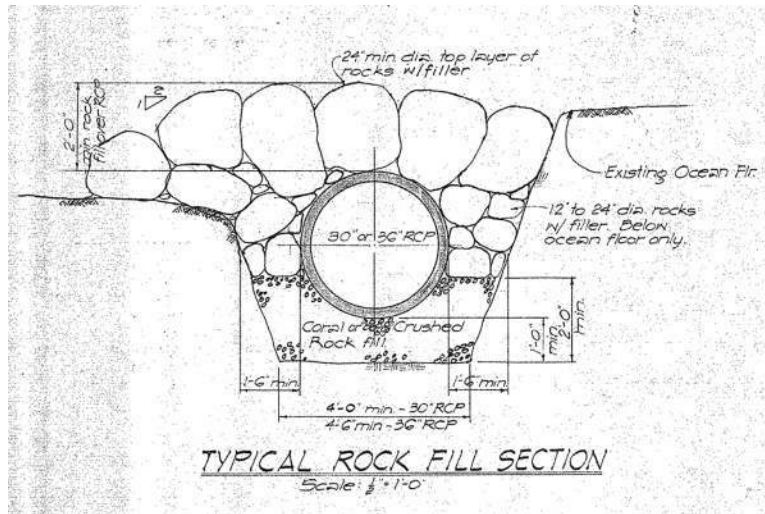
Typical section of original 1966 ballasted outfall configuration.
